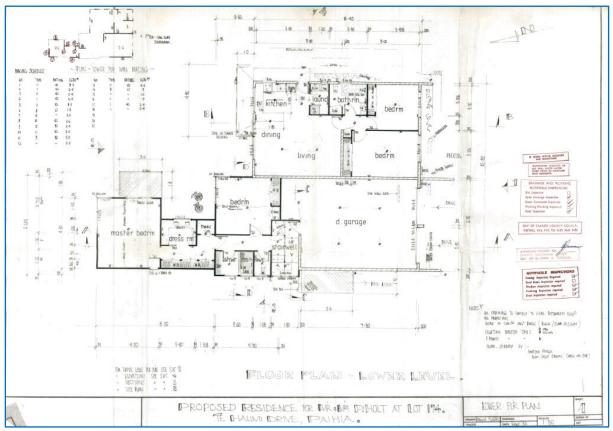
Approved Building Permit Plan showing Access, Power and Stormwater Provisions
